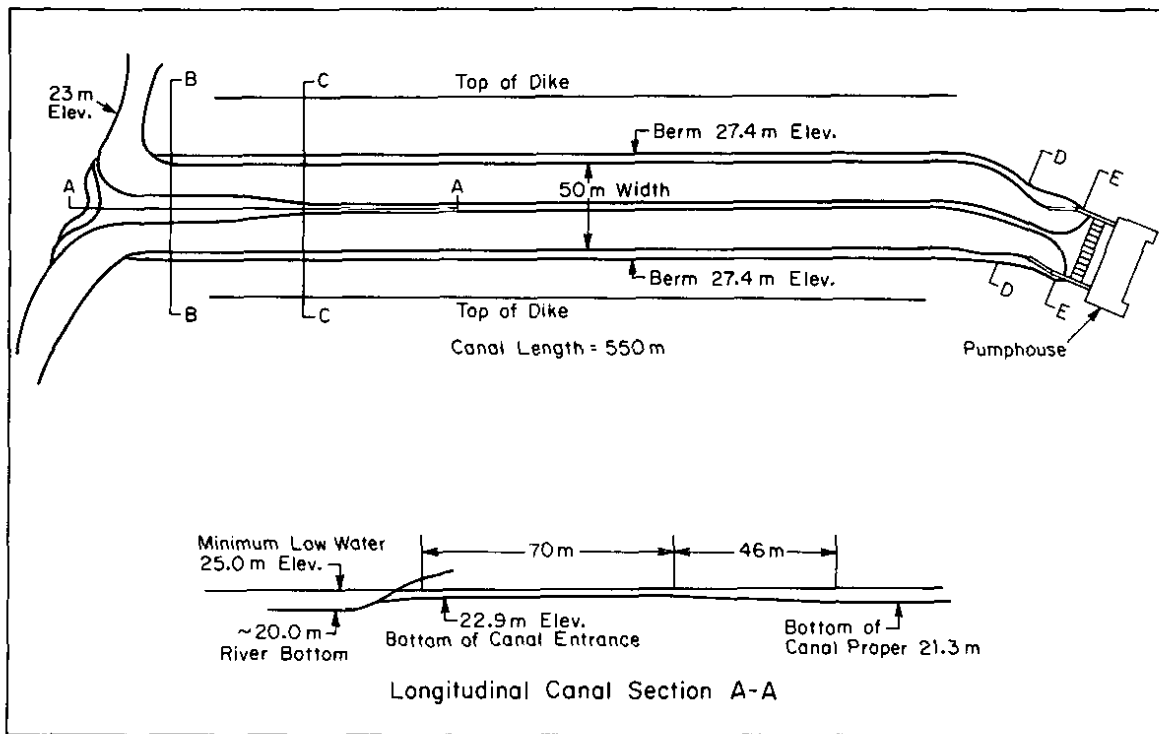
Plan View and Longitudinal Section of Entrance of 1G Canal
